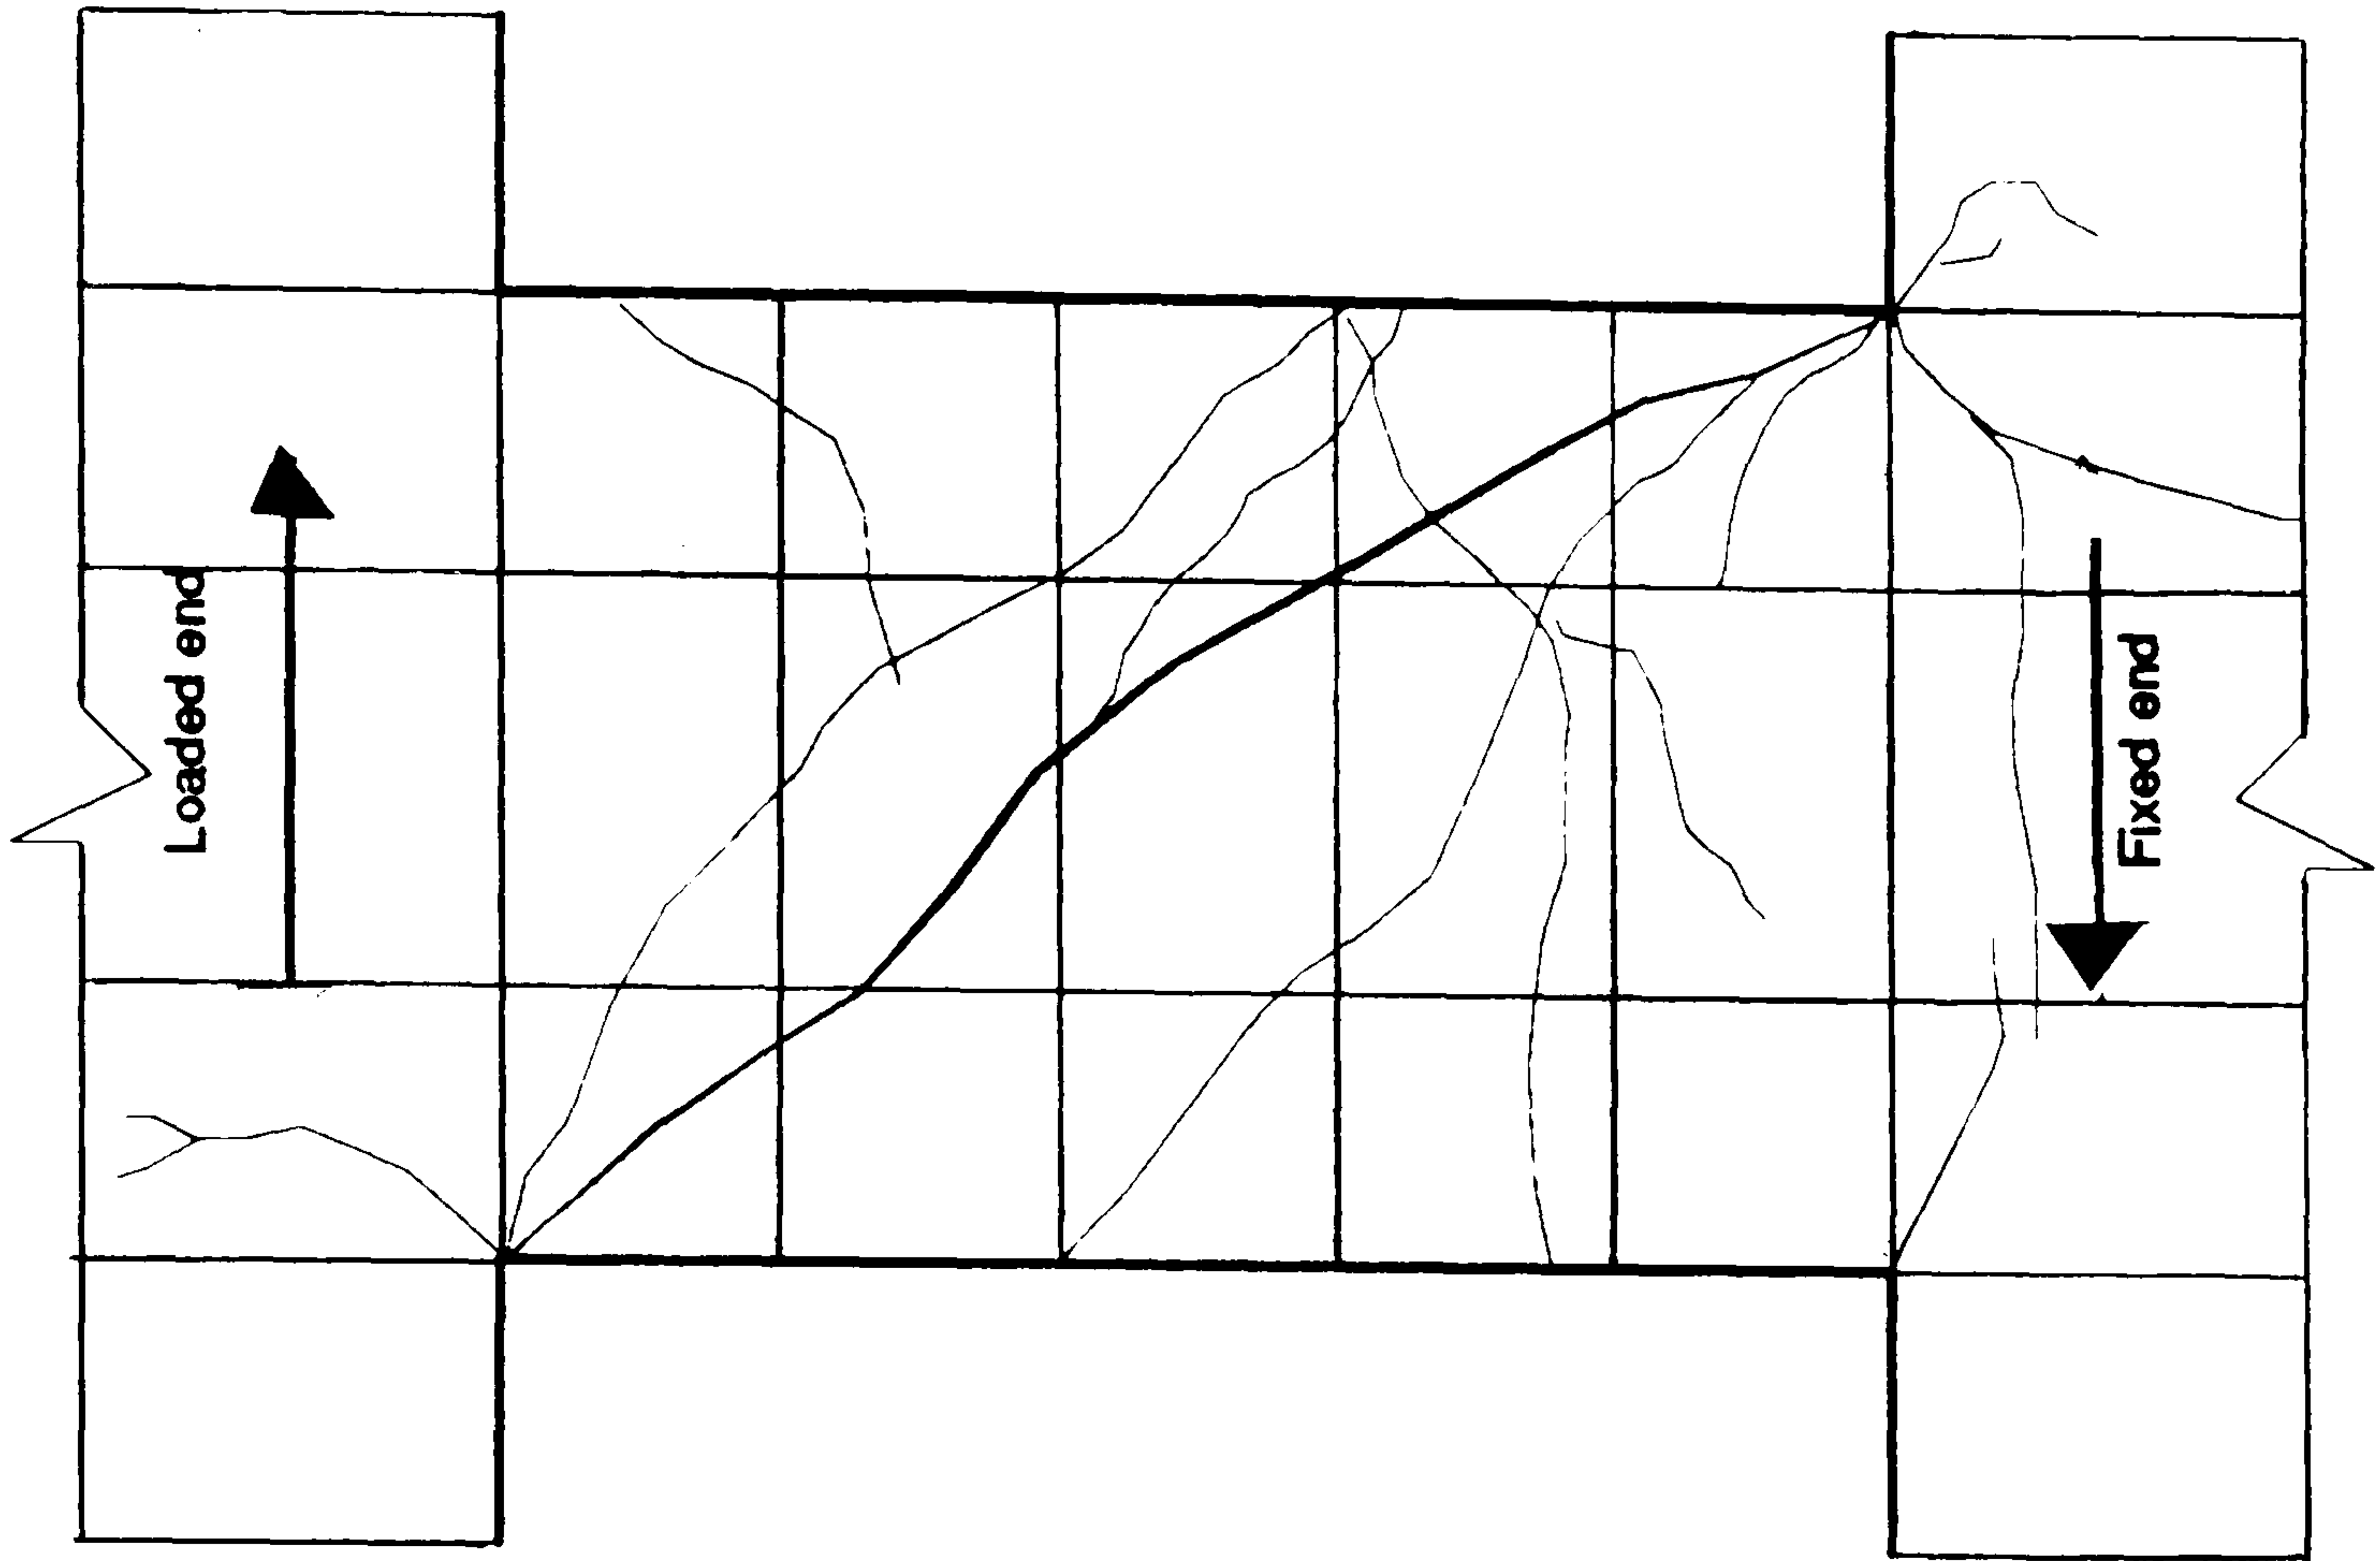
Failure mechanism and crack pattern for beam EBS1
